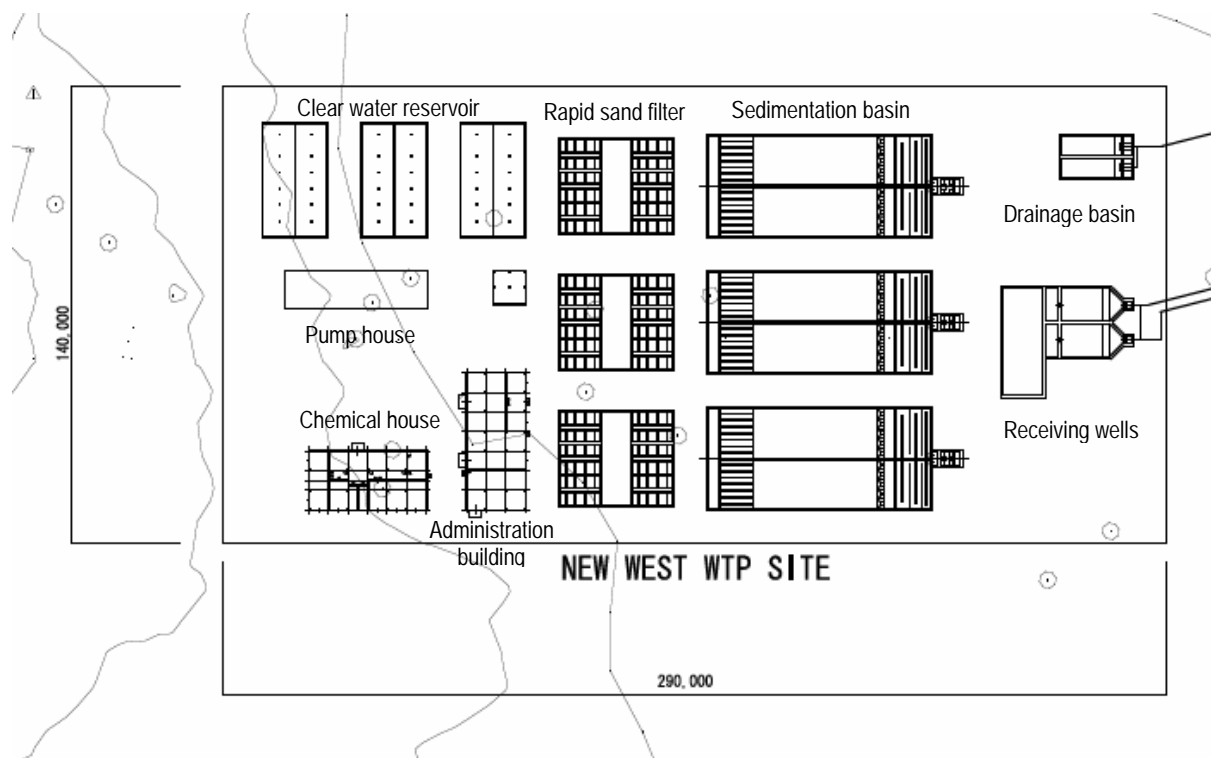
General Layout of Water Treatment Plant for West Bank
